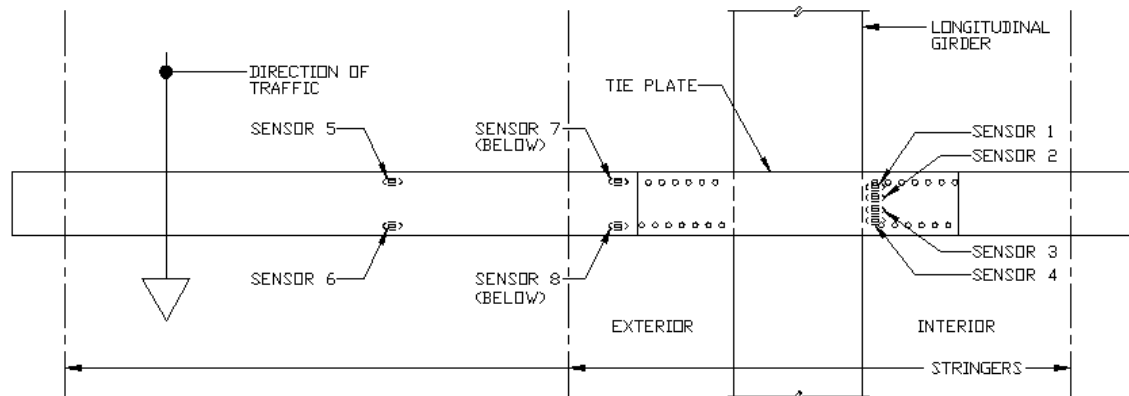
Strain gage layout for the second stage of strain monitoring, with gages located on a repaired tie plate and on the flanges of the cantilevered portion of the transverse floor beam.
